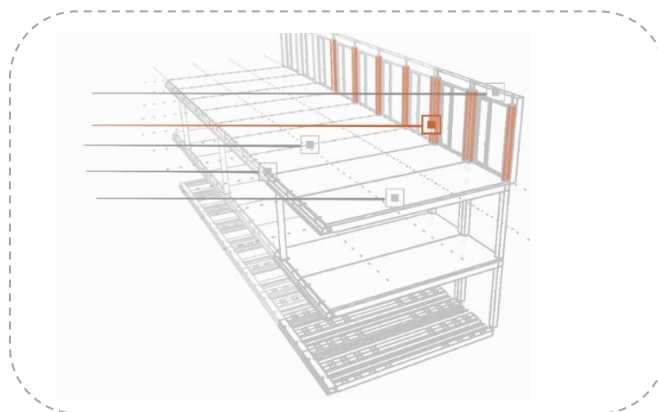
Double timber posts transmit the vertical loads. (Sustainable building systems | timber hybrid office buildings - CREE Buildings)
